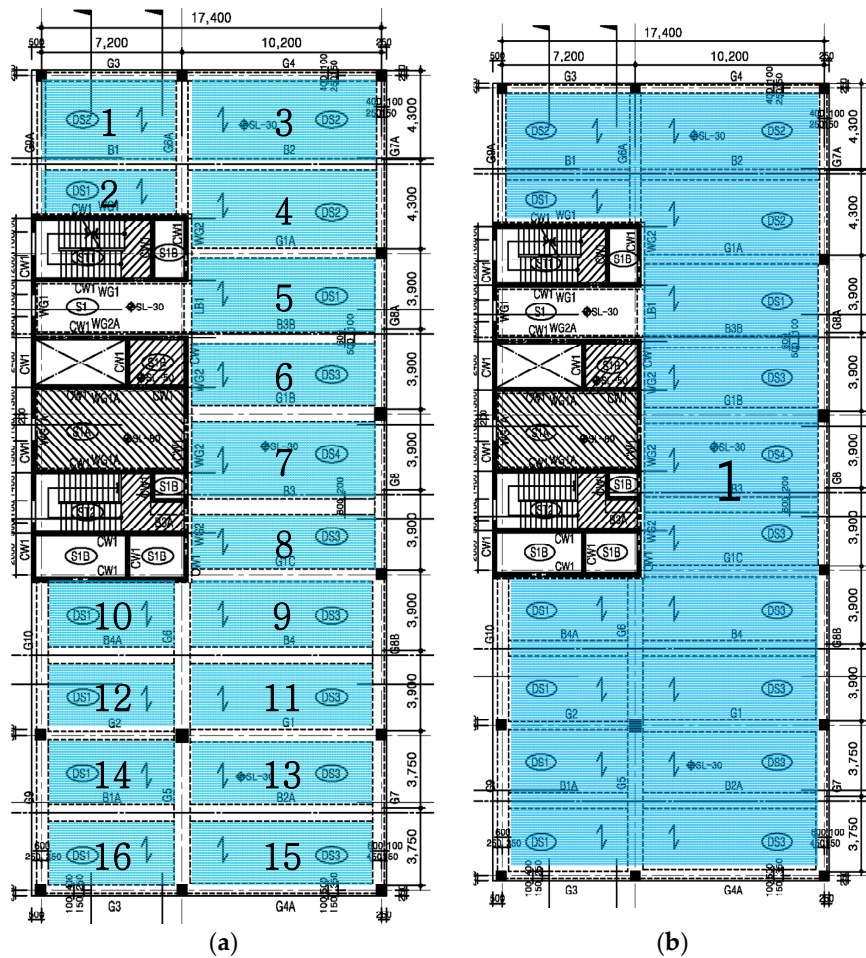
Floor plans for half-precast concrete slab system (HPCSS) and a cast-in-place slab system (CIPSS) for the case project: (a) 5th floor plan; (b) 2nd–4th floor plan.
